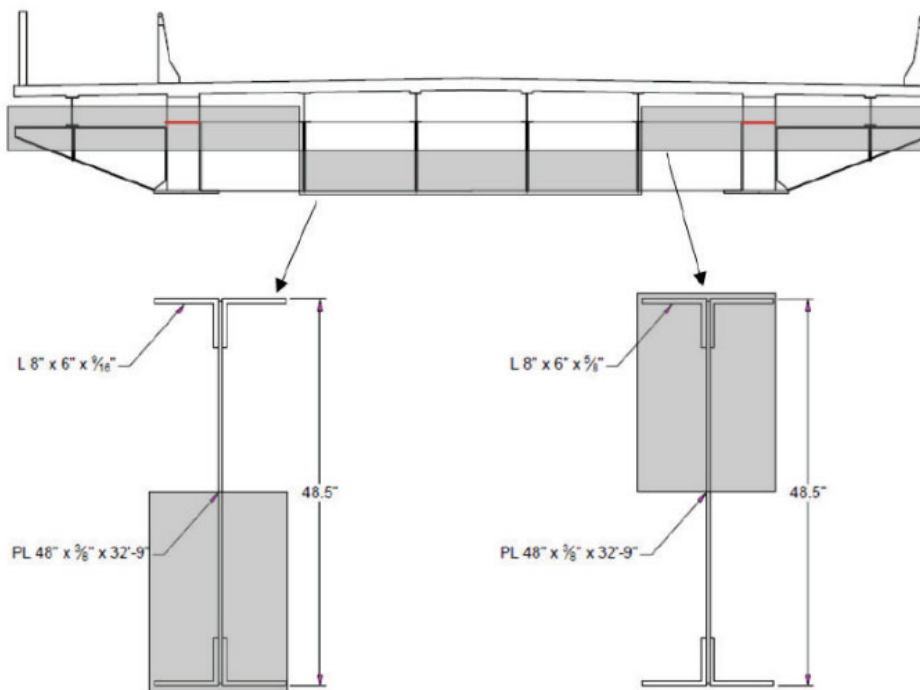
Tension elements of nonredundant steel tension members - floor beam/ outrigger (typical).
